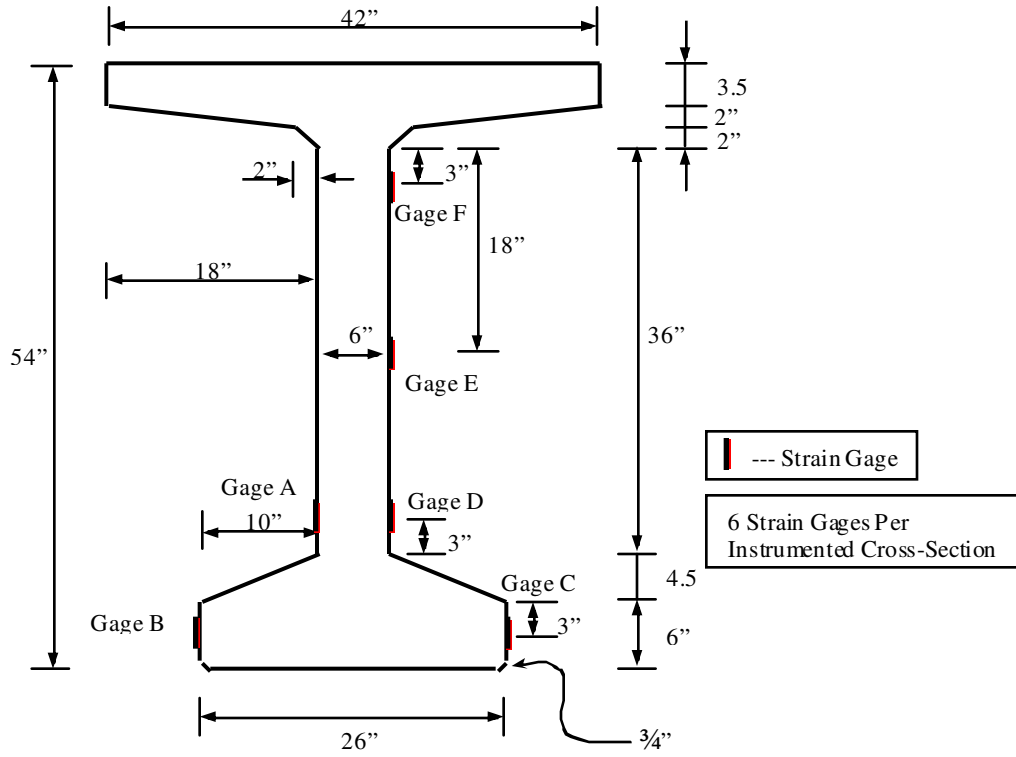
Strain Gage Layout - Span 10 and 11 Cross Section 1
